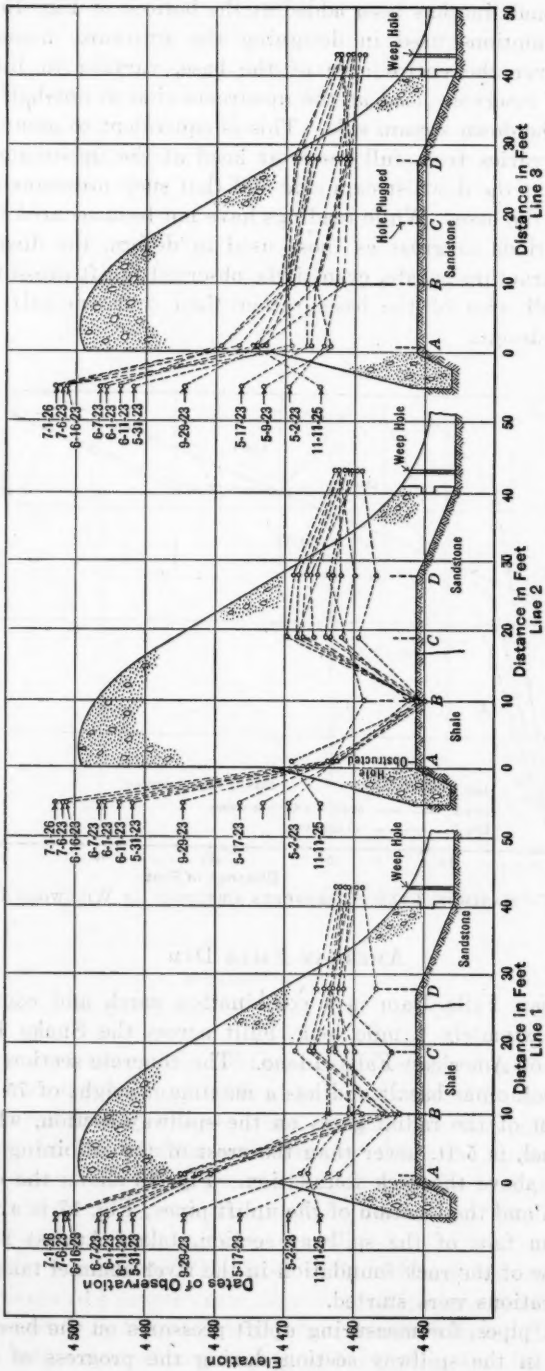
UPLIFT PRESSURES OBSERVED AT WILLWOOD DIVERSION DAM.
